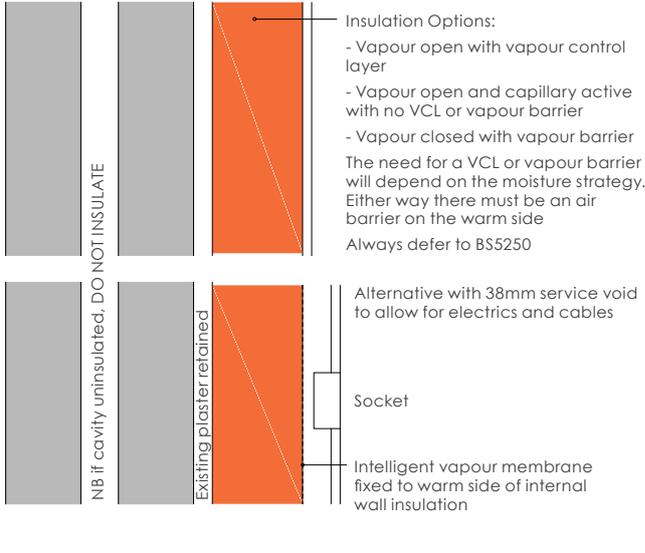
Insulation strategy for cavity wall - internal wall insulation (IWI)
